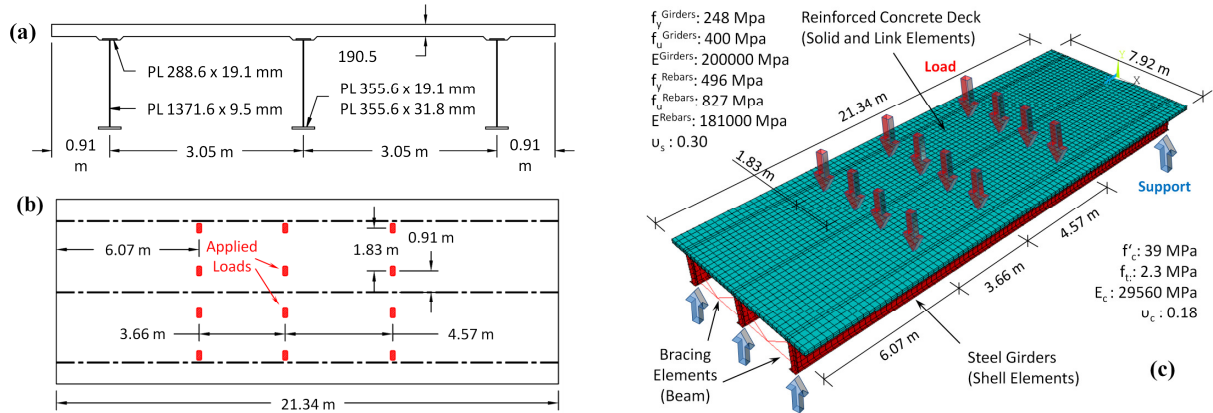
Nebraska laboratory test (a) bridge cross section, (b) bridge plan, (c) proposed FE model
